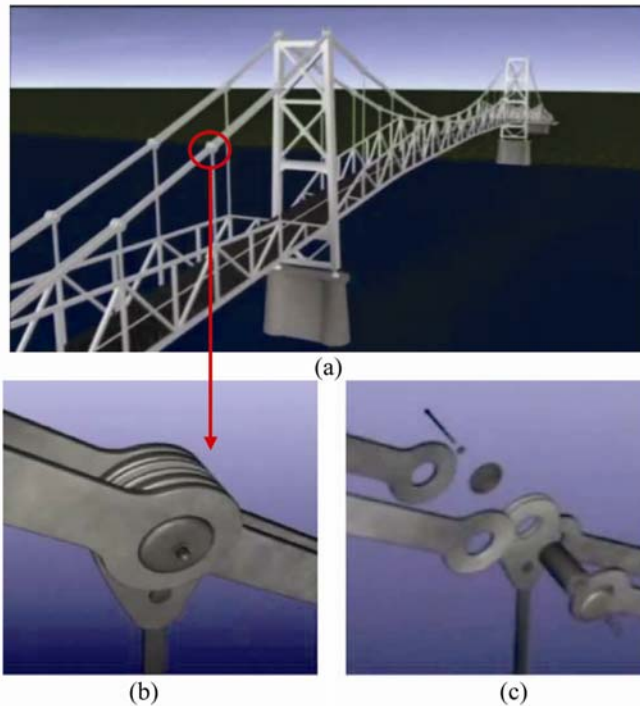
Silver Bridge disaster 1967, (a) Suspension bridge, (b) assemble view of eyebar-chain, (c) explode view of eyebar-chain
